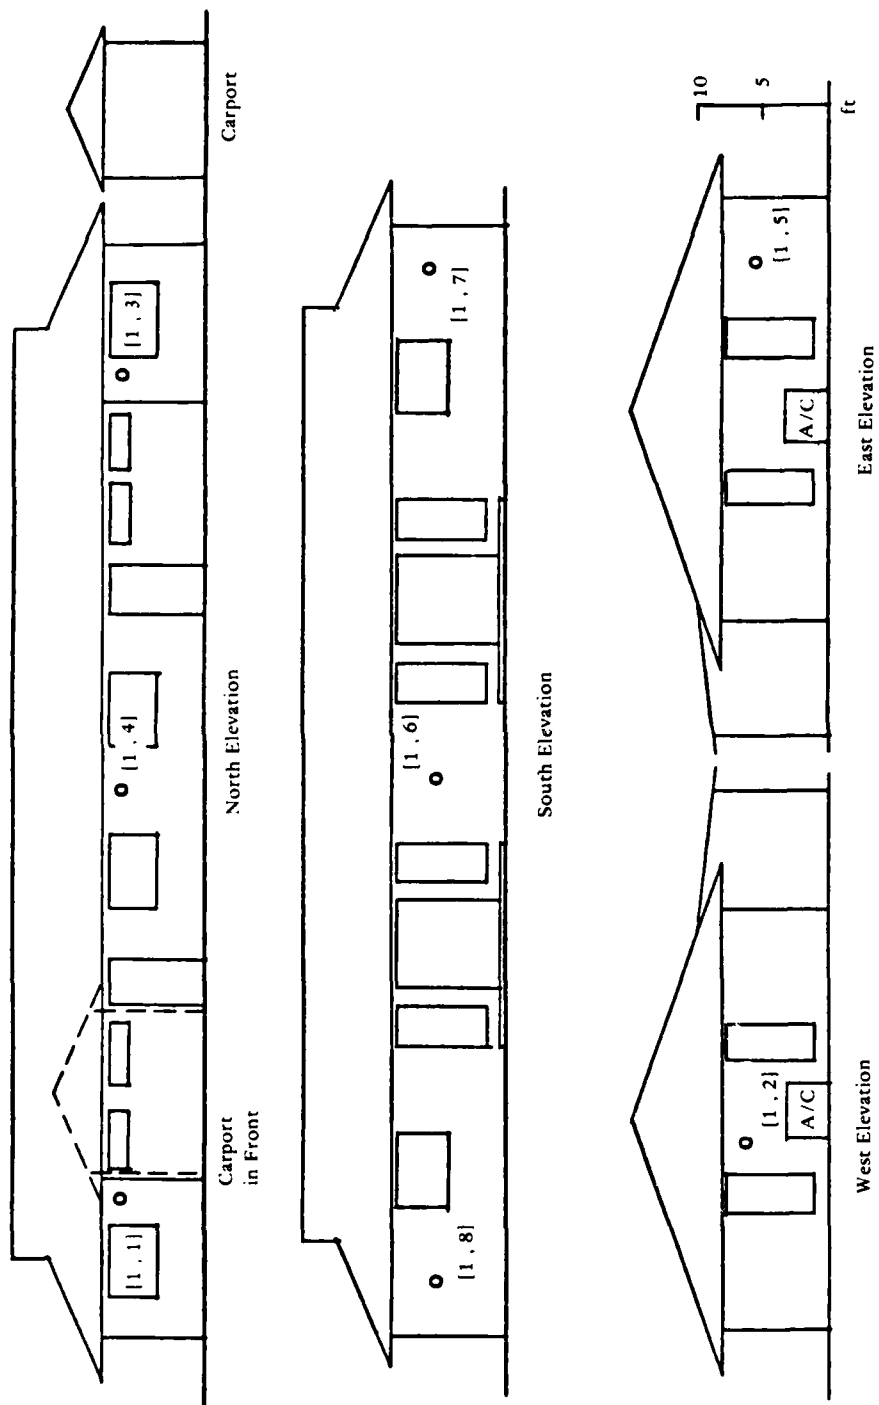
Elevation plan of Building No. 2 with the pressure taps locations shown.
